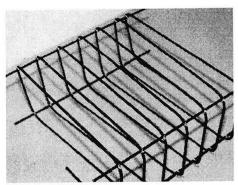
CFRP bars and stirrups, Tokyo Rope Mfg. Co.
